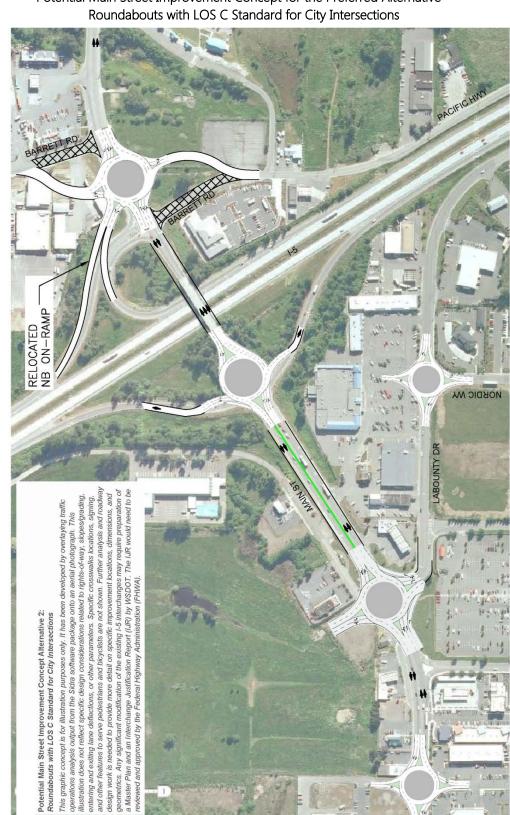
Potential Main Street Improvement Concept for the Preferred Alternative – Roundabouts with LOS C Standard for City Intersections
